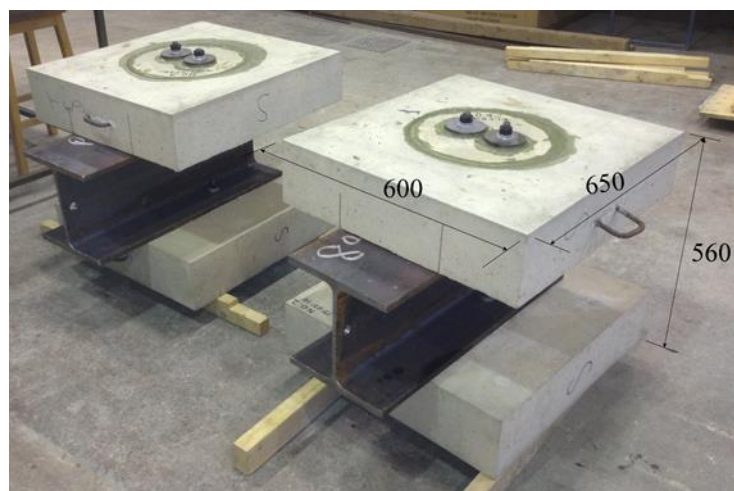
Grouting and bolts tightening of the LNSC pushout tests 1 and 2
